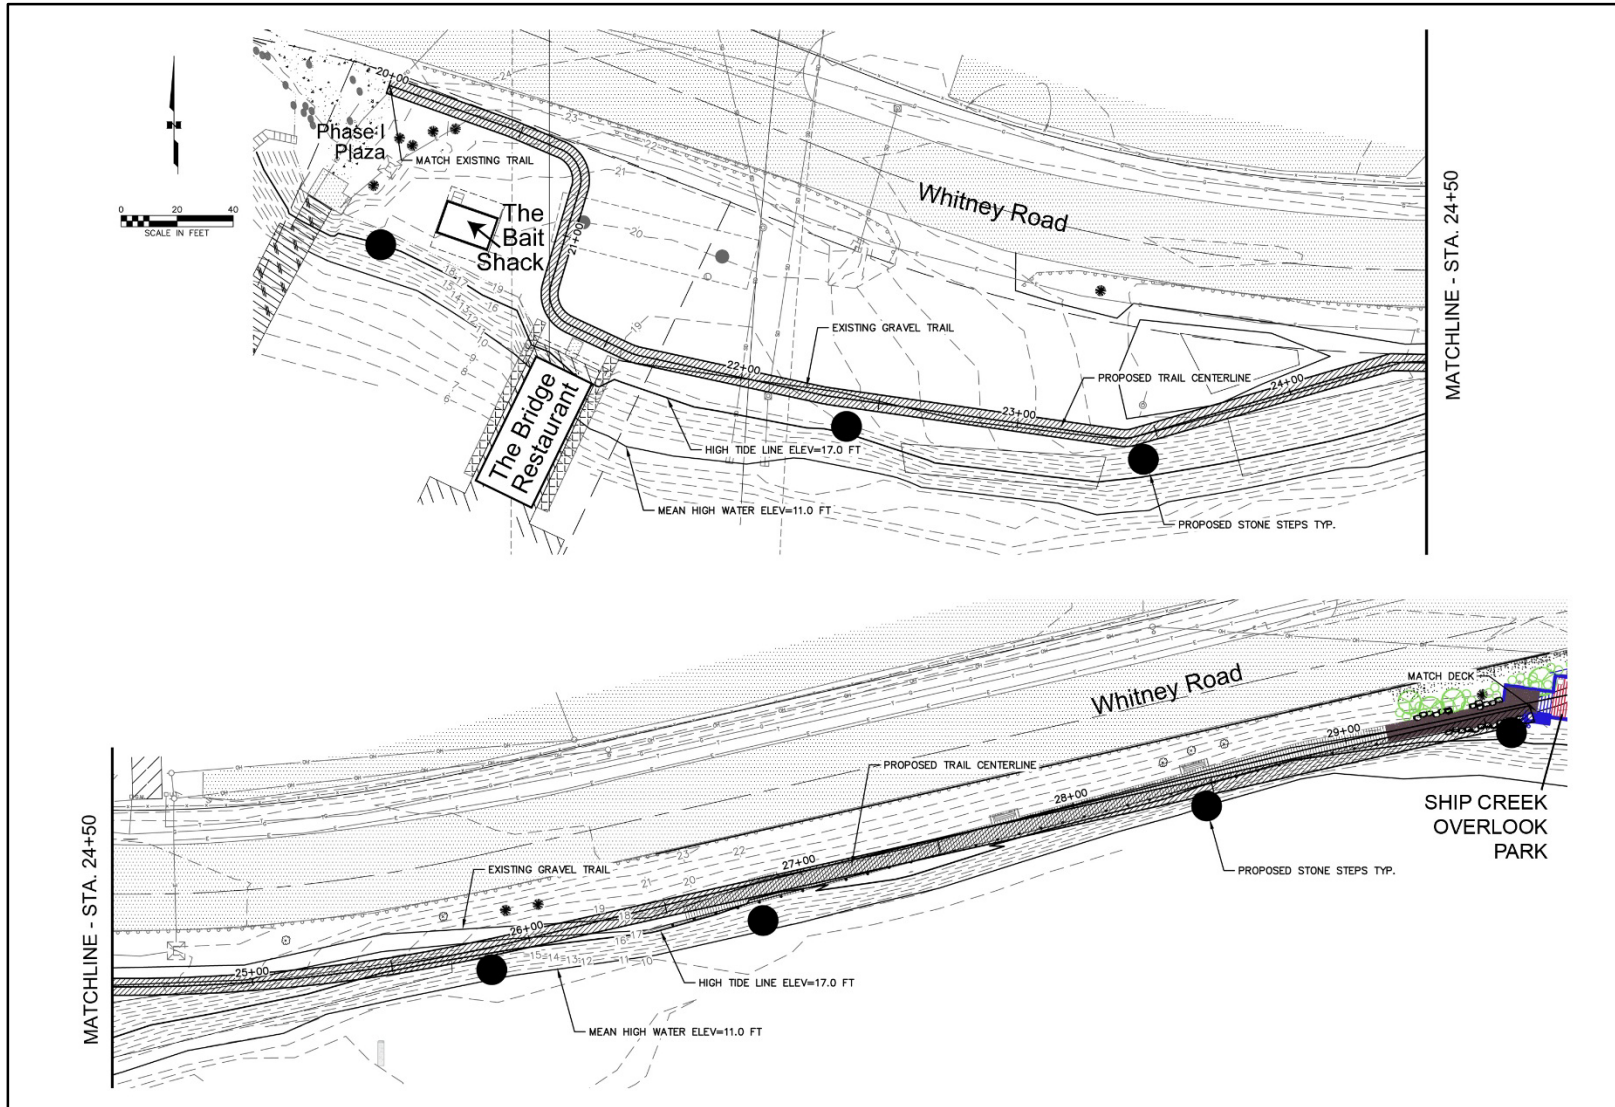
Plan view of North Bank Trail improvements, with locations of stone steps.
